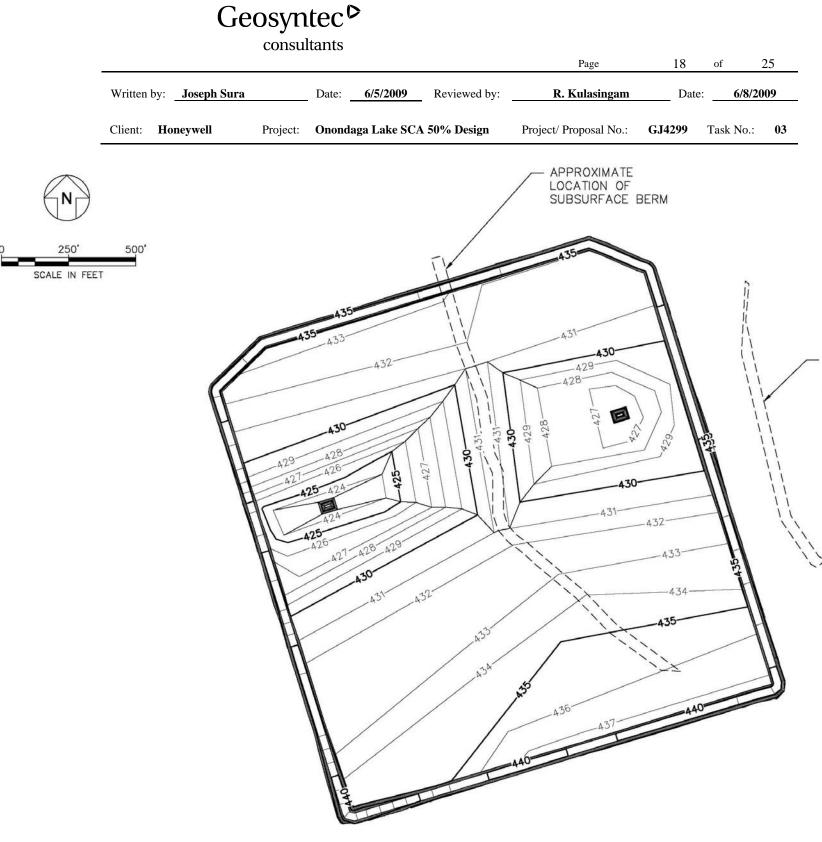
Proposed Low Permeability Soil Liner Grading Plan for Option 1 (2.65 million cy)
